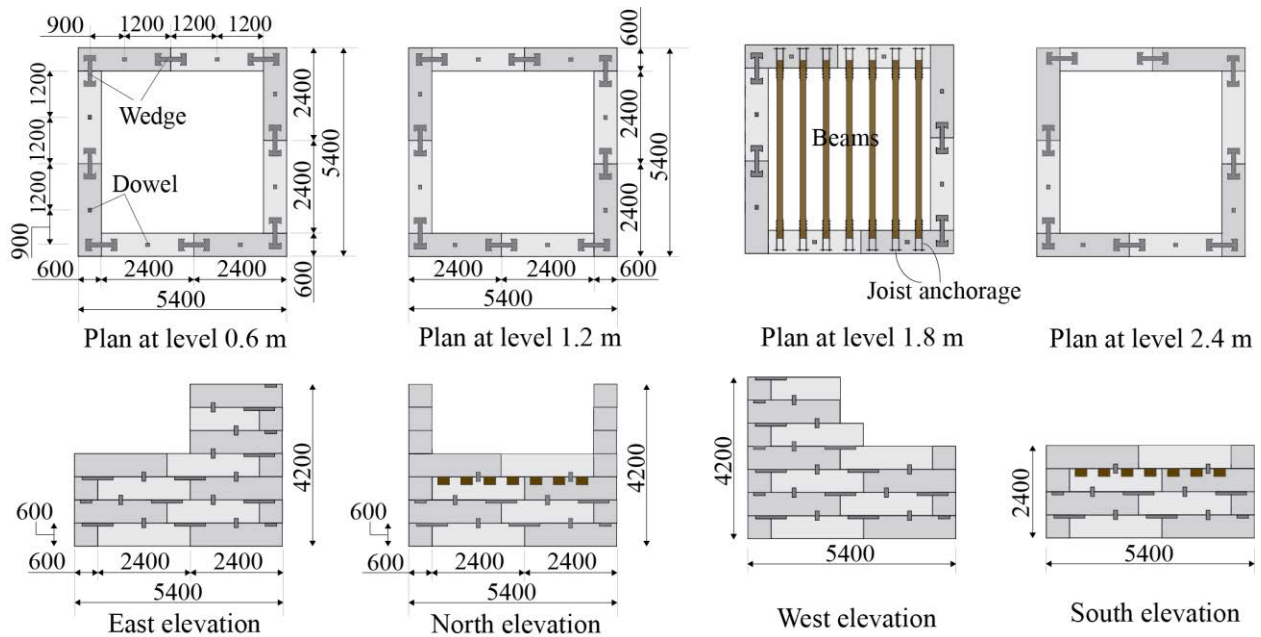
Details of reinforced rammed earth specimen (R-RE).
